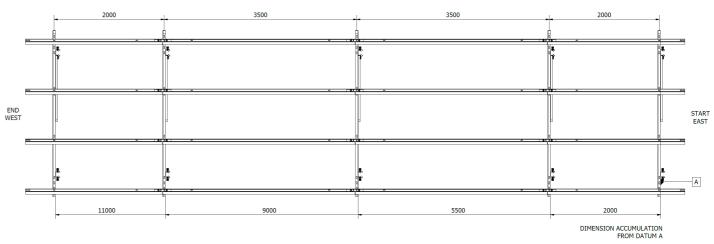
A typical plan view from supplied drawings showing foundation positions
